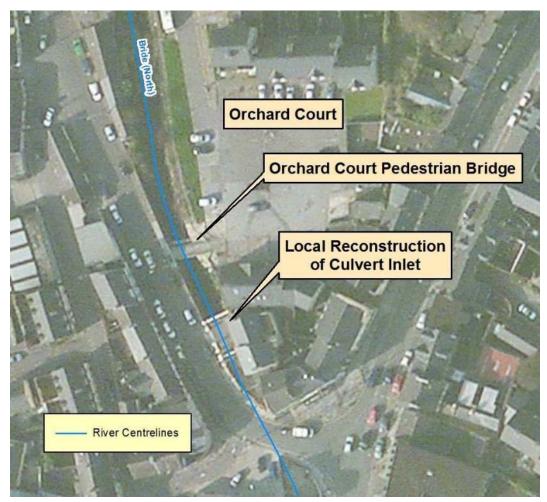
Reconstruction of Culvert Inlet at Orchard Court
